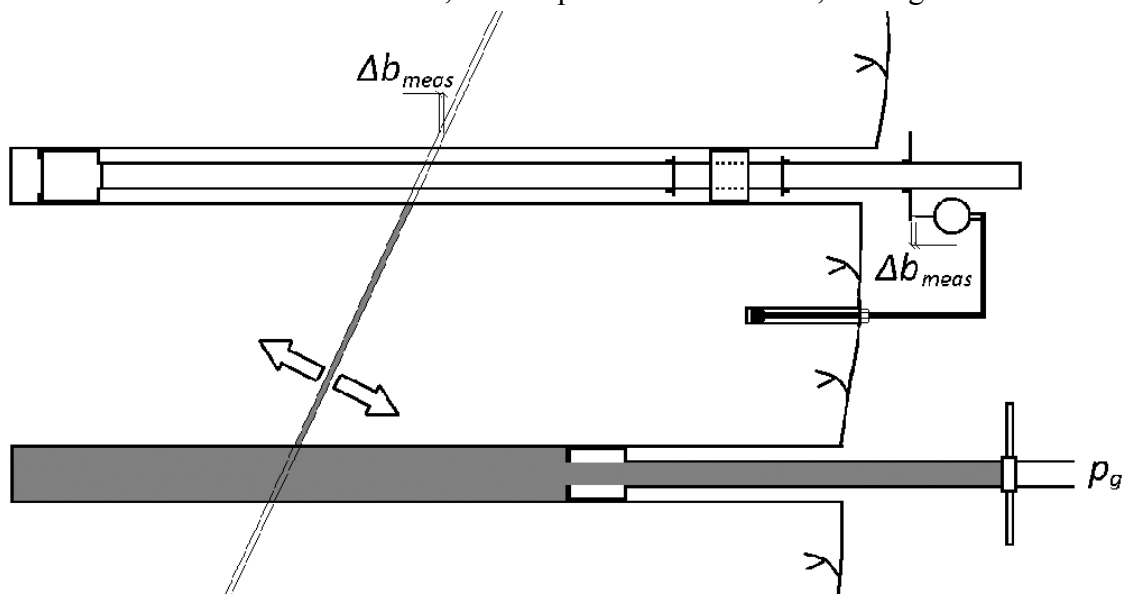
The principle for deformation measurements. A packer is placed in the lower borehole, which is grouted. The grout pressure causes a fracture to deform. In the upper borehole a rod is fastened at the bottom of the hole with an anchor, the rod is suspended with Teflon bushings. A deformation sensor attached to the wall measures the relative movement between the wall and the rod, i.e. the total deformation along the borehole. It is favourable if the distance between the boreholes is smaller than the fracture intensity, i.e. the block size.
